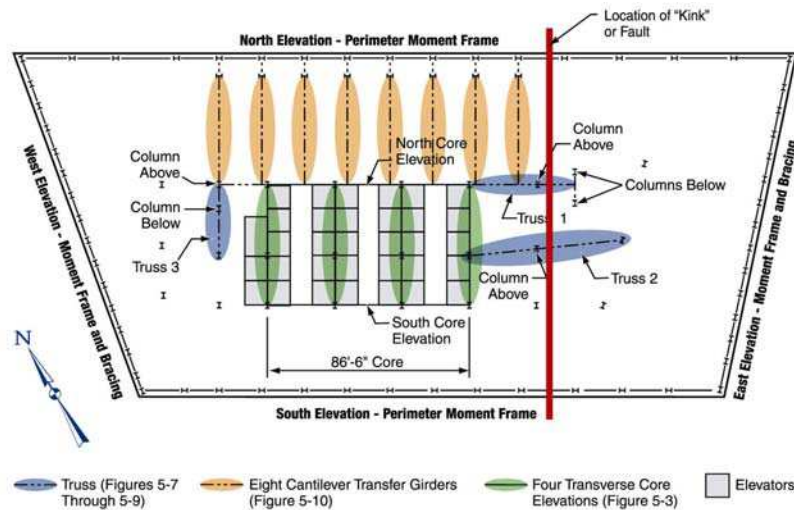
Area of potential transfer truss failure in WTC 7¹
